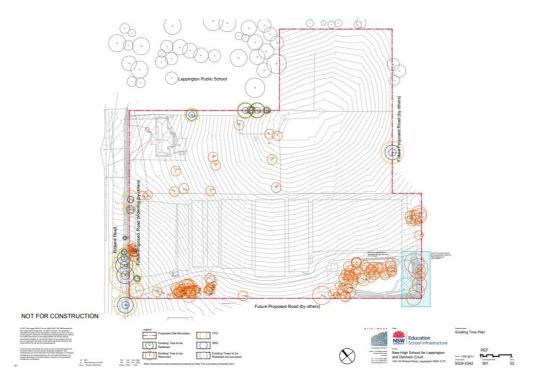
Existing Tree Plan (Source: Site Image Landscape Architects)
